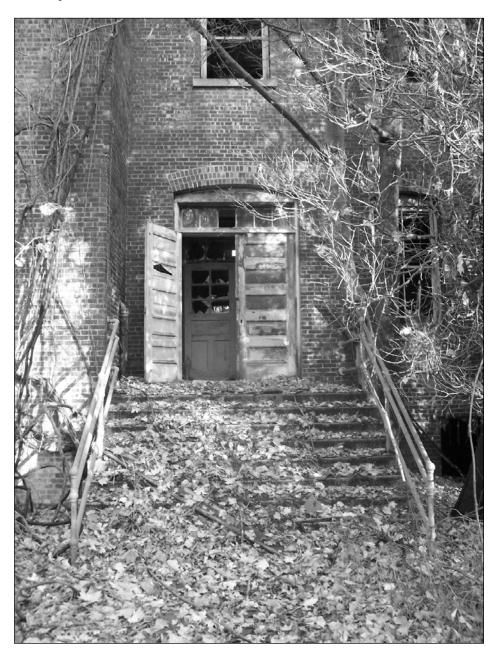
Western façade, southern half of central pavilion and south wing, facing east-southeast.
